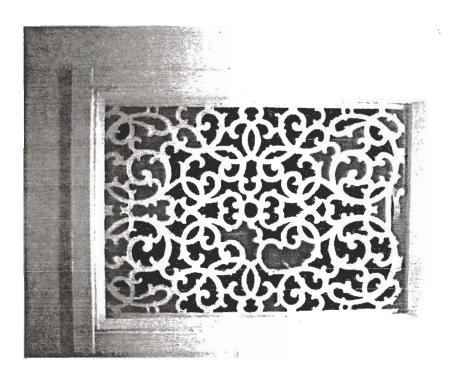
Third Floor (Fresh Air) Ceiling Grille.
